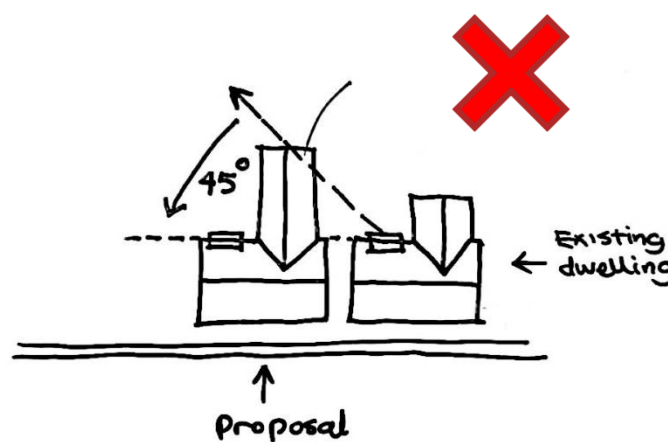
below shows the proposed dwelling crosses the 25° rule for natural light and would not normally be acceptable.
